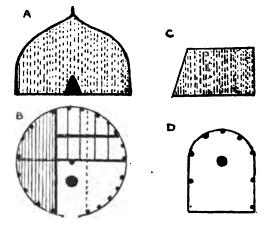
A and B, Elevation and plan of a Miriam round house; c and D, Elevation and plan of an eud meta on Mer, by A. W. Scale, 16 ft. to 1 in.
